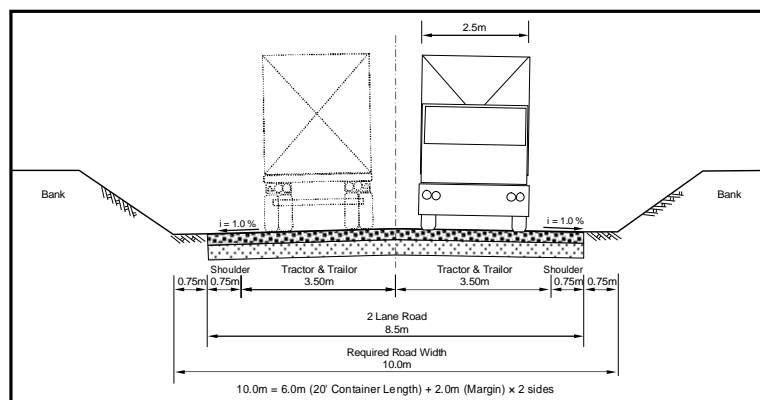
Plan Width of North Side Access Road
